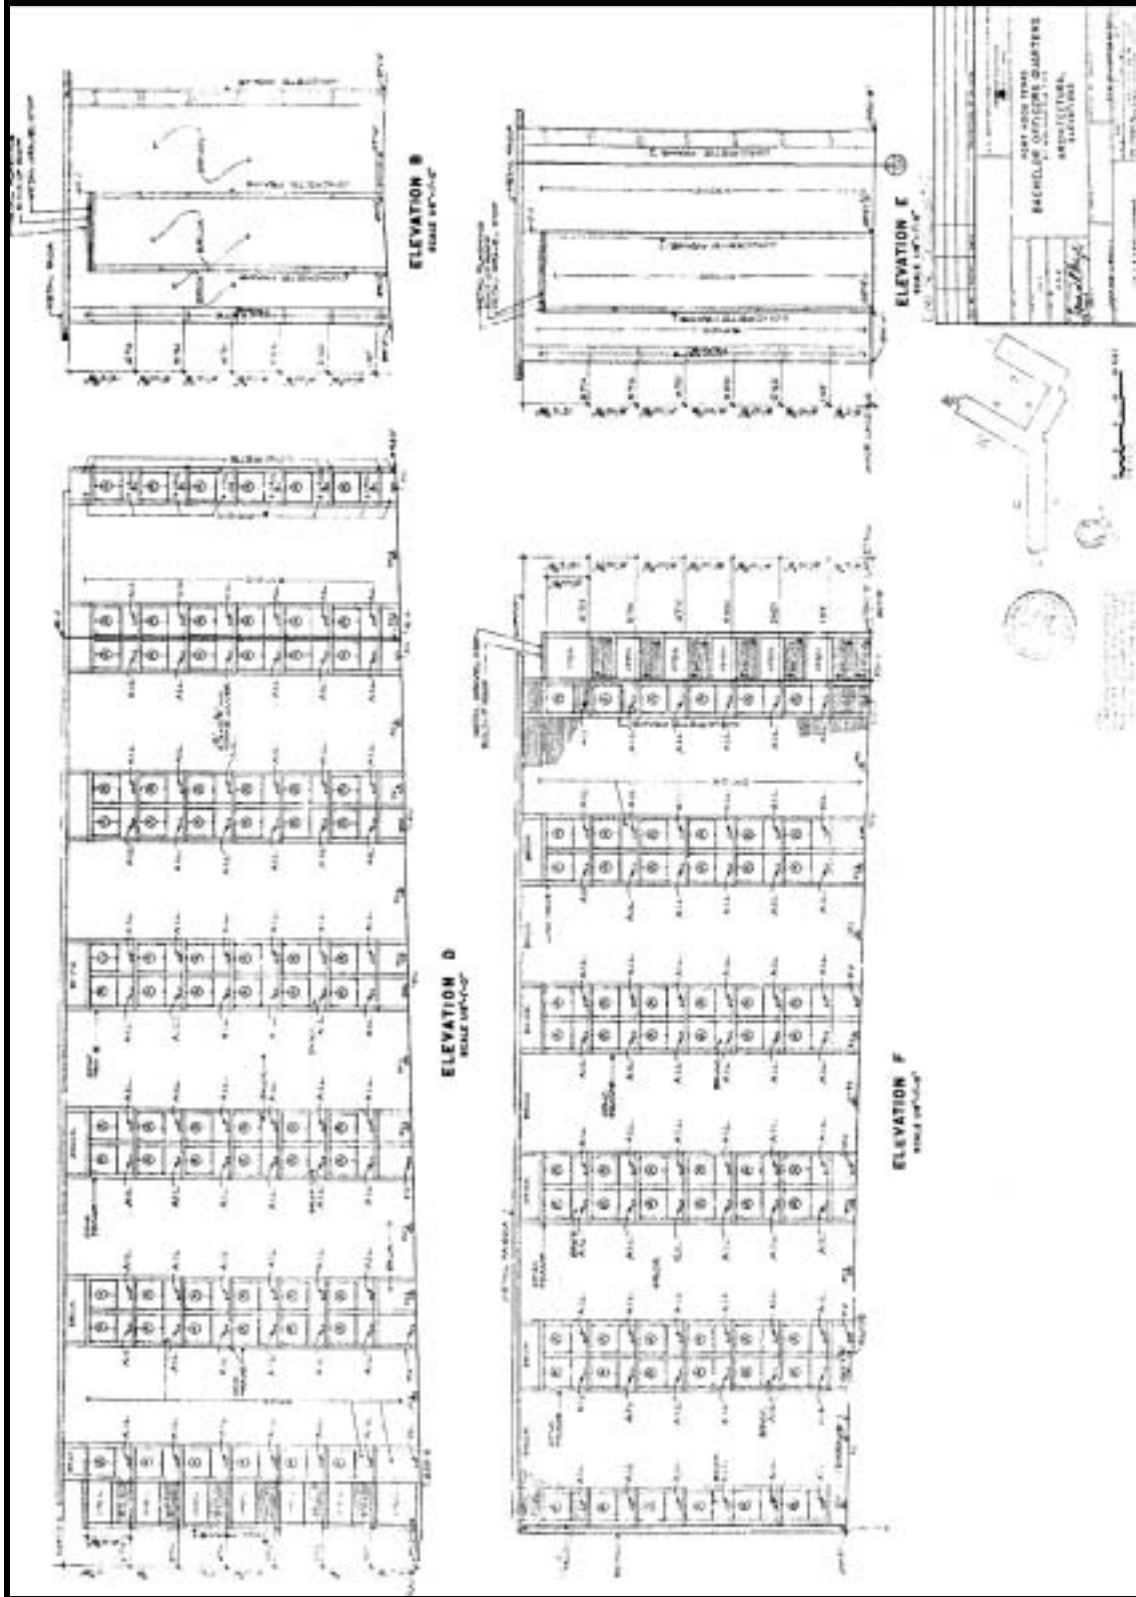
High Rise BOQ, Keith Ware Hall, elevations D, B, F, & E, Ft. Hood (ca. 1967) (Engineering, Ft. Hood).
